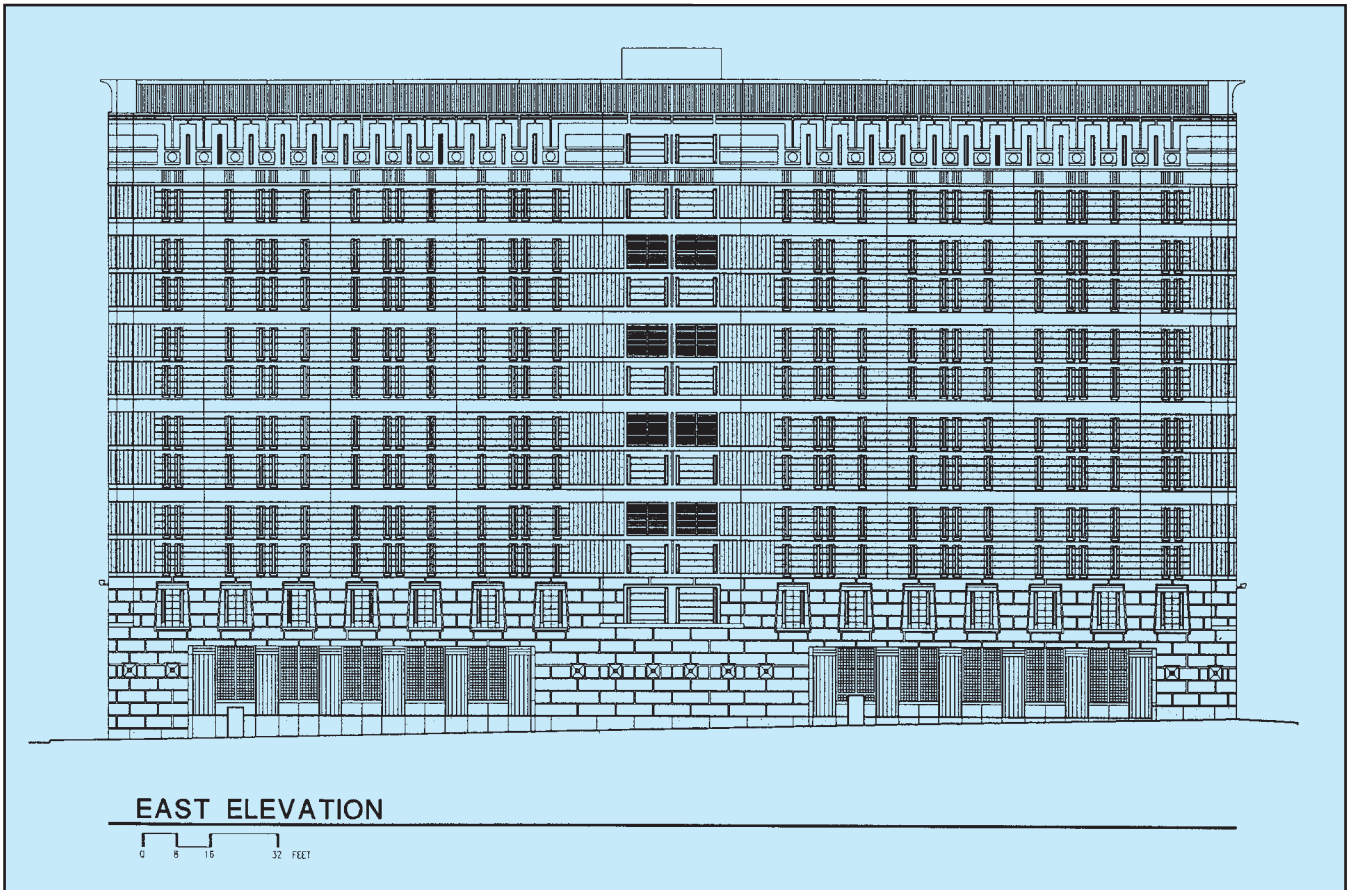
East elevation shows the detailed architectural look that reduces the building's visual mass.
